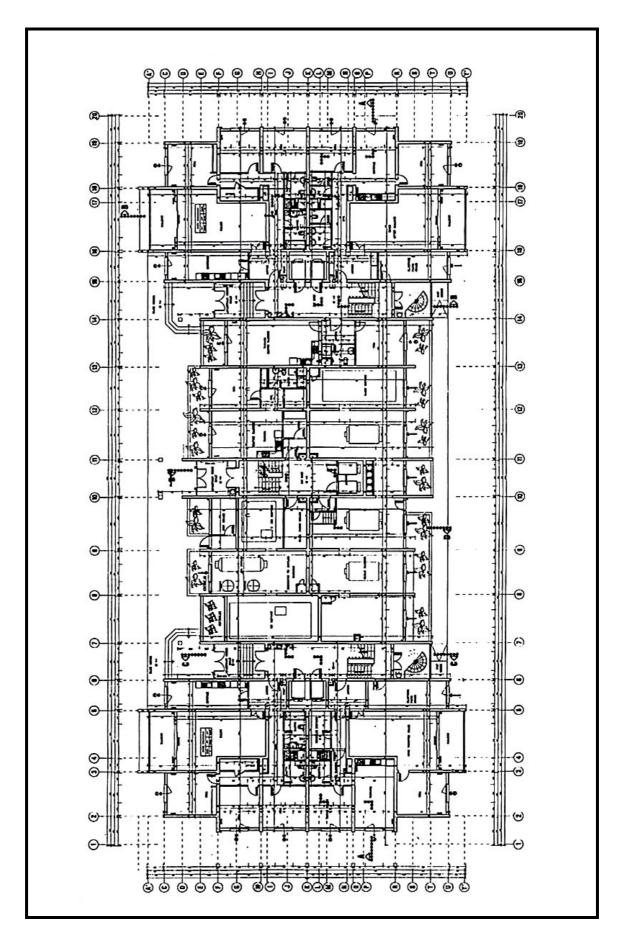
Mavişehir II; Kuğu Ground–Floor Plan
